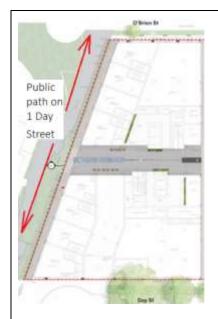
Landsacpe plan showing adjoining pubicly acessible pathway on 1 Day Street.
